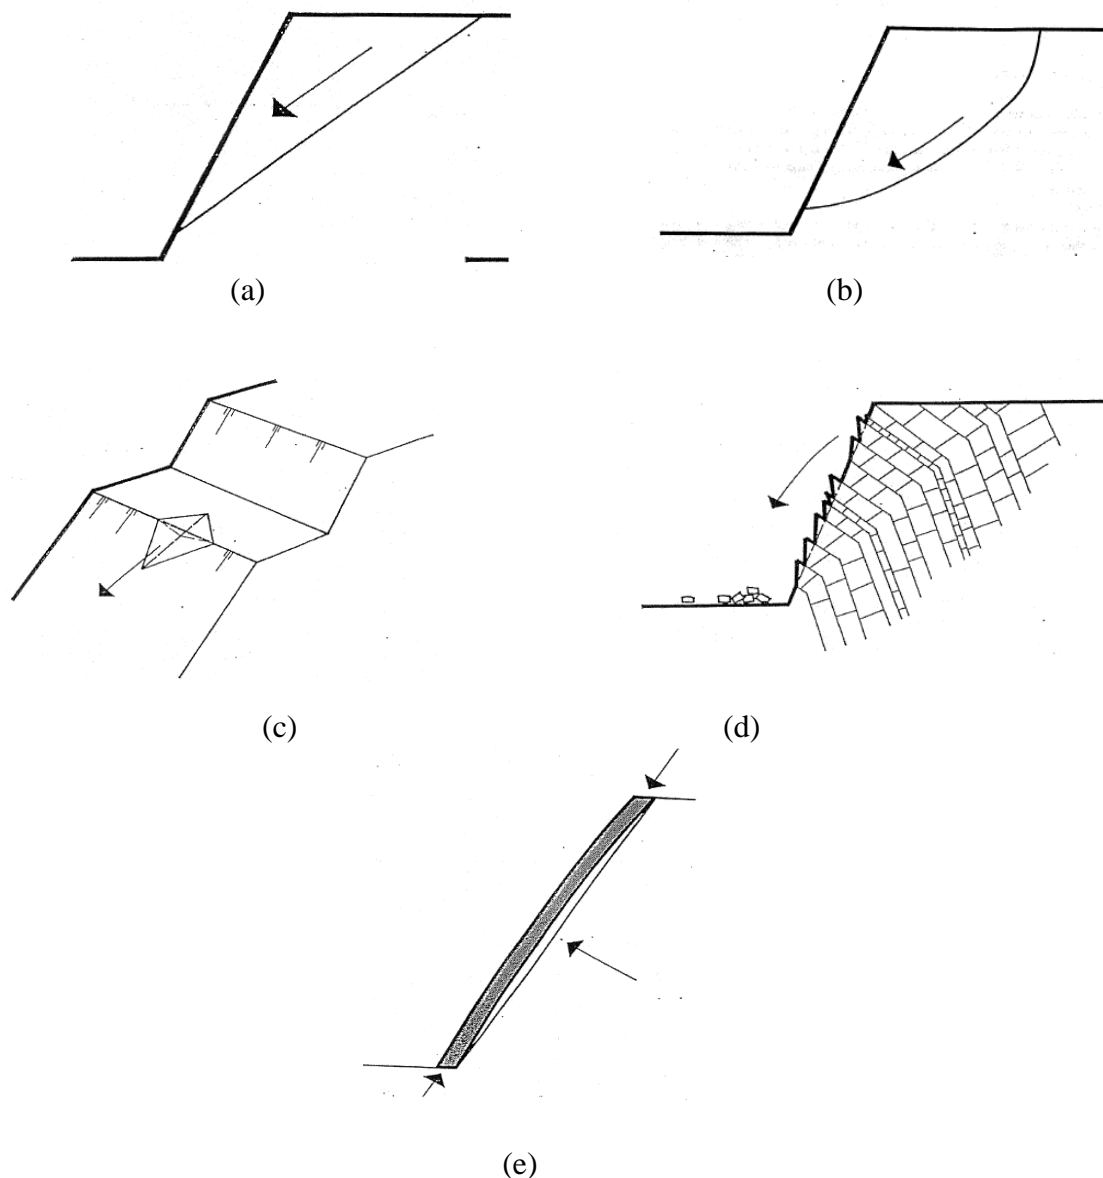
Types of rock slope failure: (a) plane failure, (b) circular failure, (c) wedge failure, (d) toppling failure, and (e) buckling failure. (adapted from Hoek and Bray, 1981; Goodman, 1989; Kliche, 1999; Wyllie and Mah, 2004)
